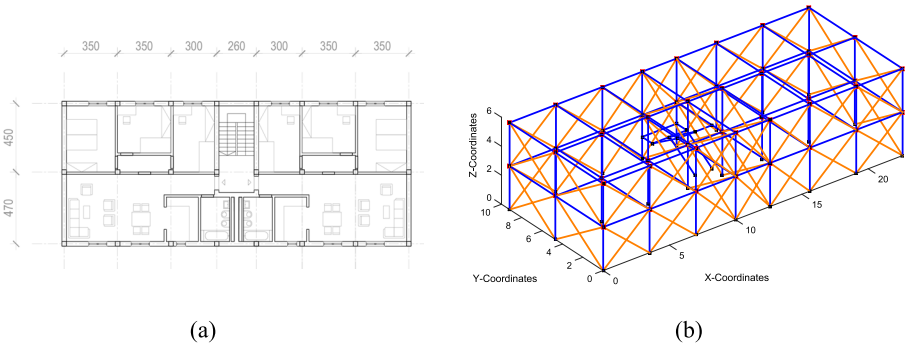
a Architectural plan layout and b numerical model of the two-storey infilled RC building GLD-D-2
